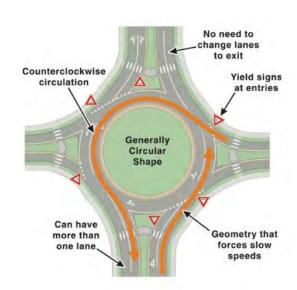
TYPICAL ROUNDABOUT LAYOUT
